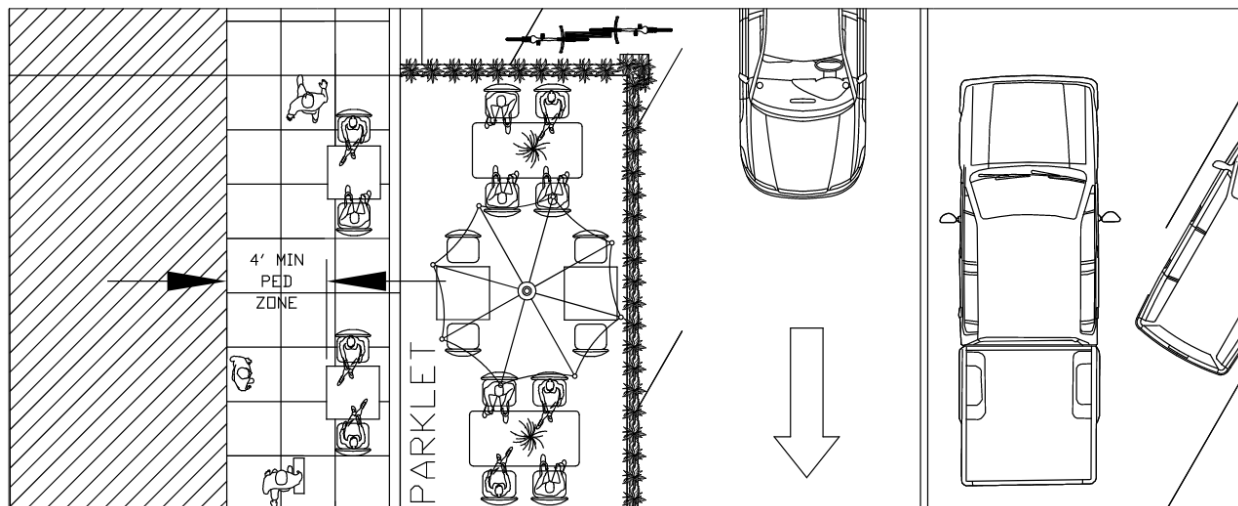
Example Site Plan of Parklet and Sidewalk Use for Dining
